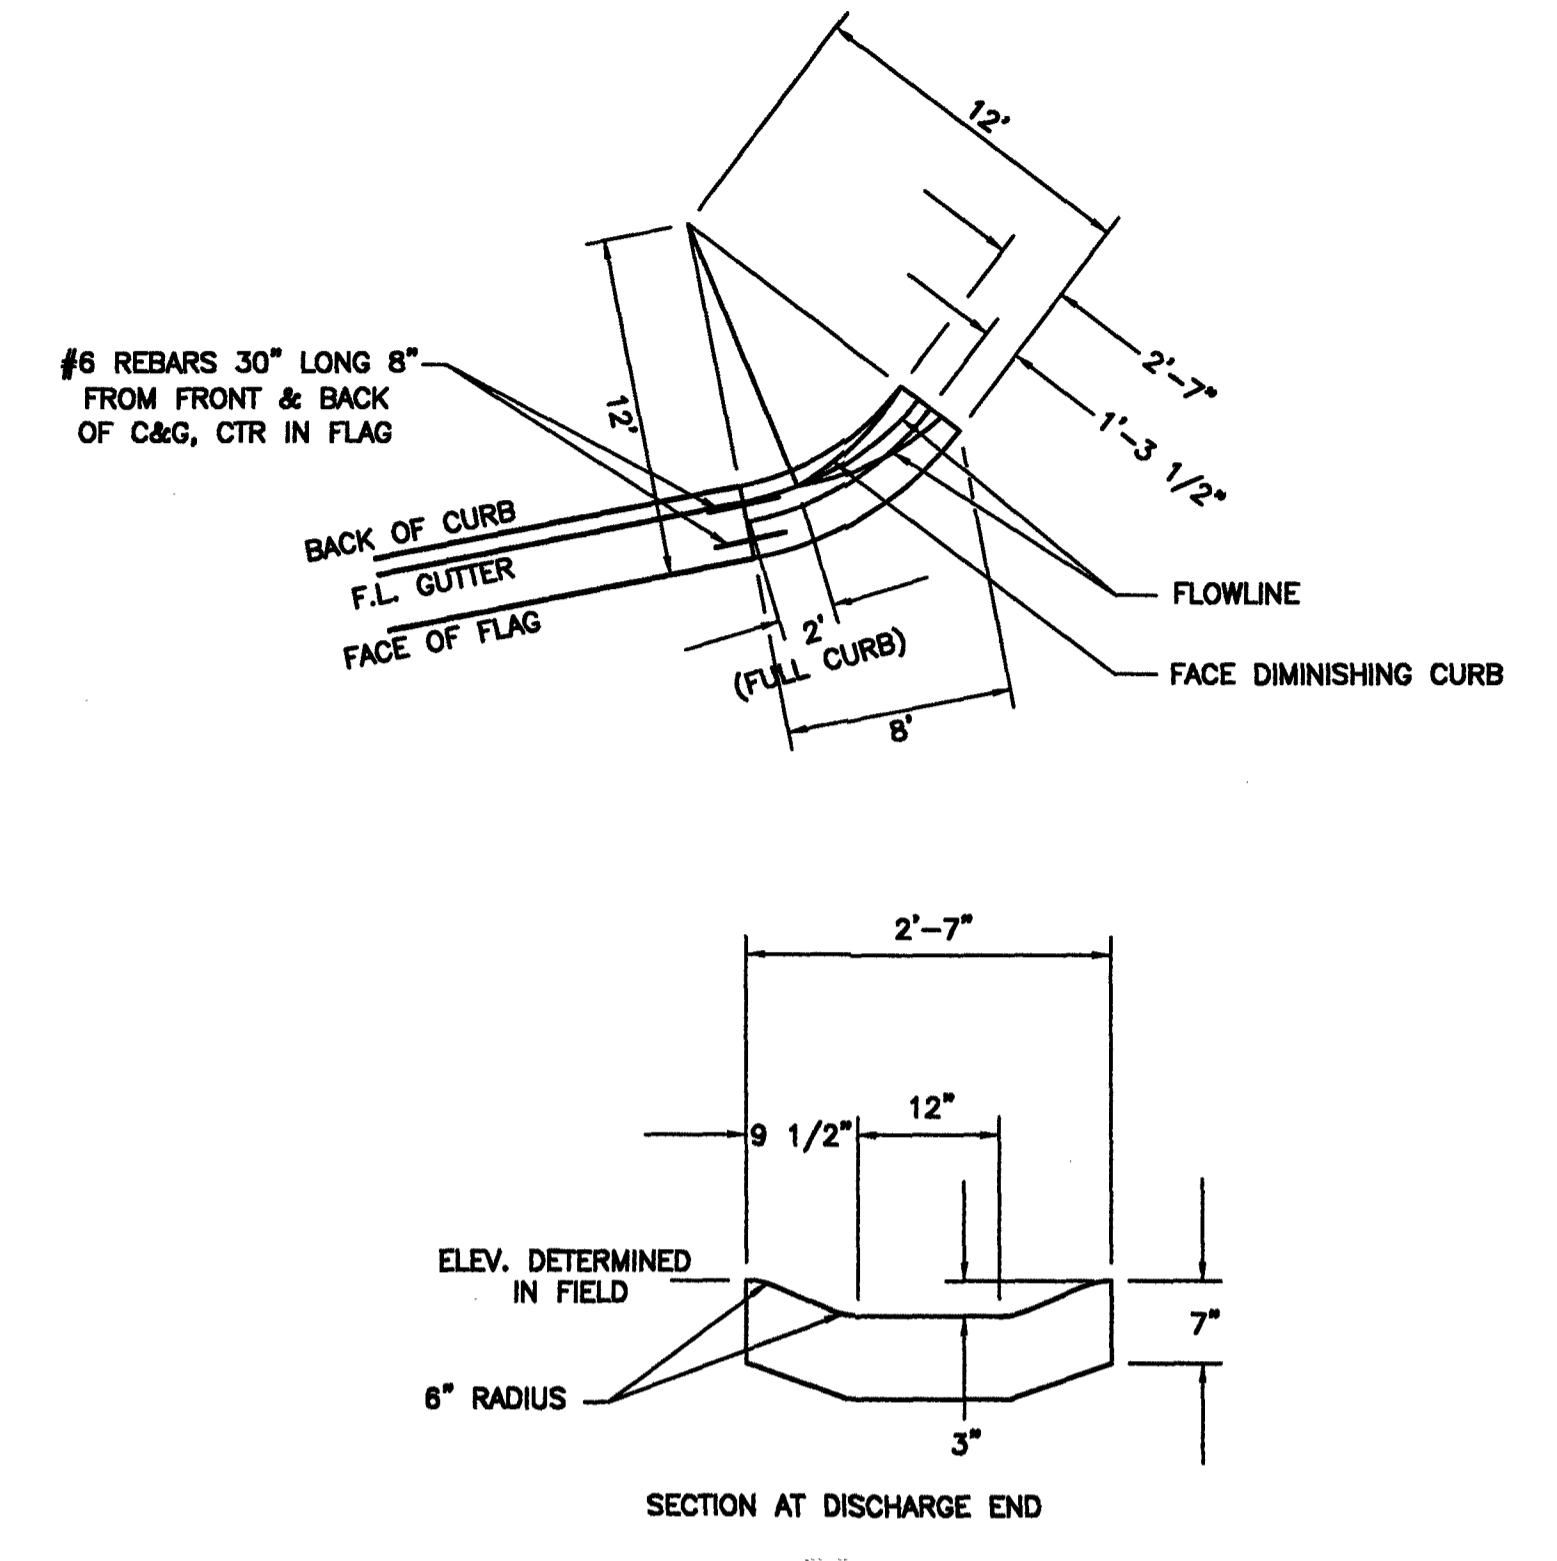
DETAIL OF CLASS SI CONCRETE (OUTLET), SPECIAL RT. 1+03 (RECTOR ST.)
